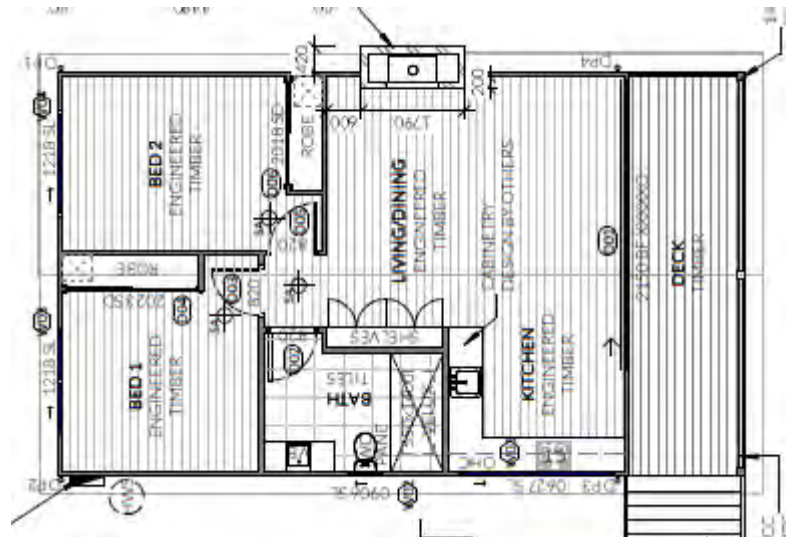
69.3sqm floor plate for 2-bedroom secondary dwelling (approved as Short-term accommodation at file MCU22/0022).
